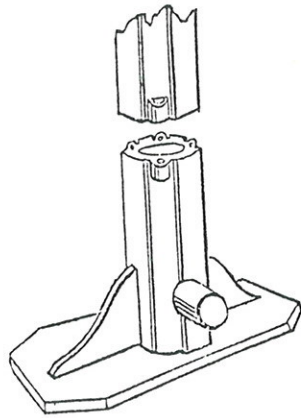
Interpretive reconstructed sectional elevation of foundation column at SW corner of porte-cochere.
